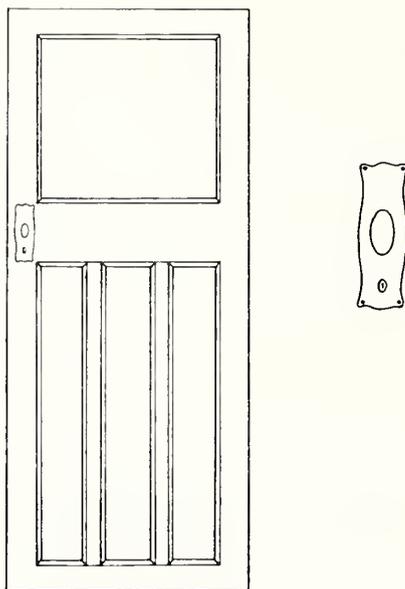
Front and inside doors (left) and handle plate (right), 13 White Avenue.
